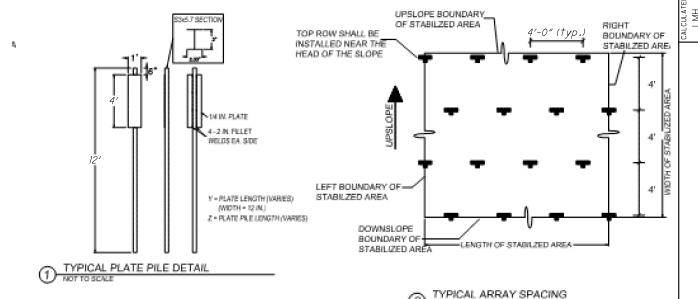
PLATE PILE SHALL BE INSTALLED SUCH THAT THE PLATE IS ALWAYS ON THE UPHILL SIDE (DETAIL 4).
